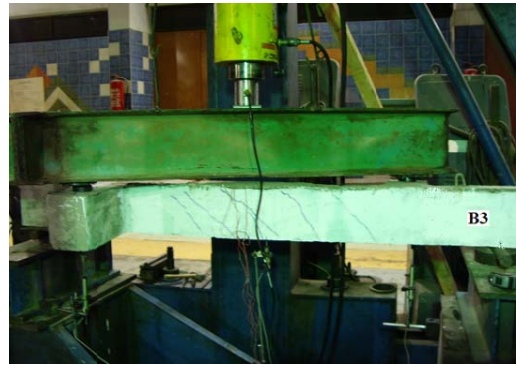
(d) Failure modes and crack patterns of the tested beam B3
